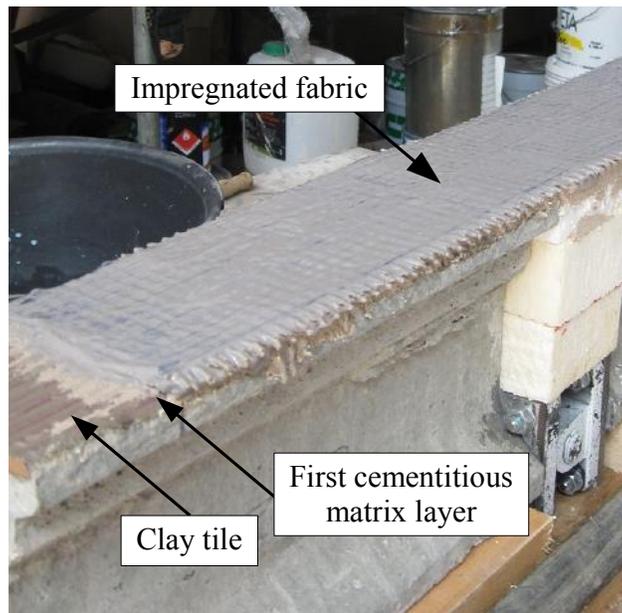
The roof concrete beam is placed upside down for lamination (clay tile on top, steel hinge for the beam test at the bottom)
